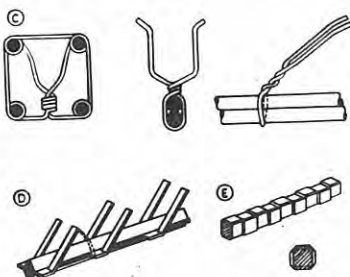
Early reinforced concrete was characterised by a flood of patents such as the Paragon System (top left) and the Clinton Floor (above), and (C) the BRC hoop and stirrup, (D) the Kahn Bar and (E) the Indented Bar.
